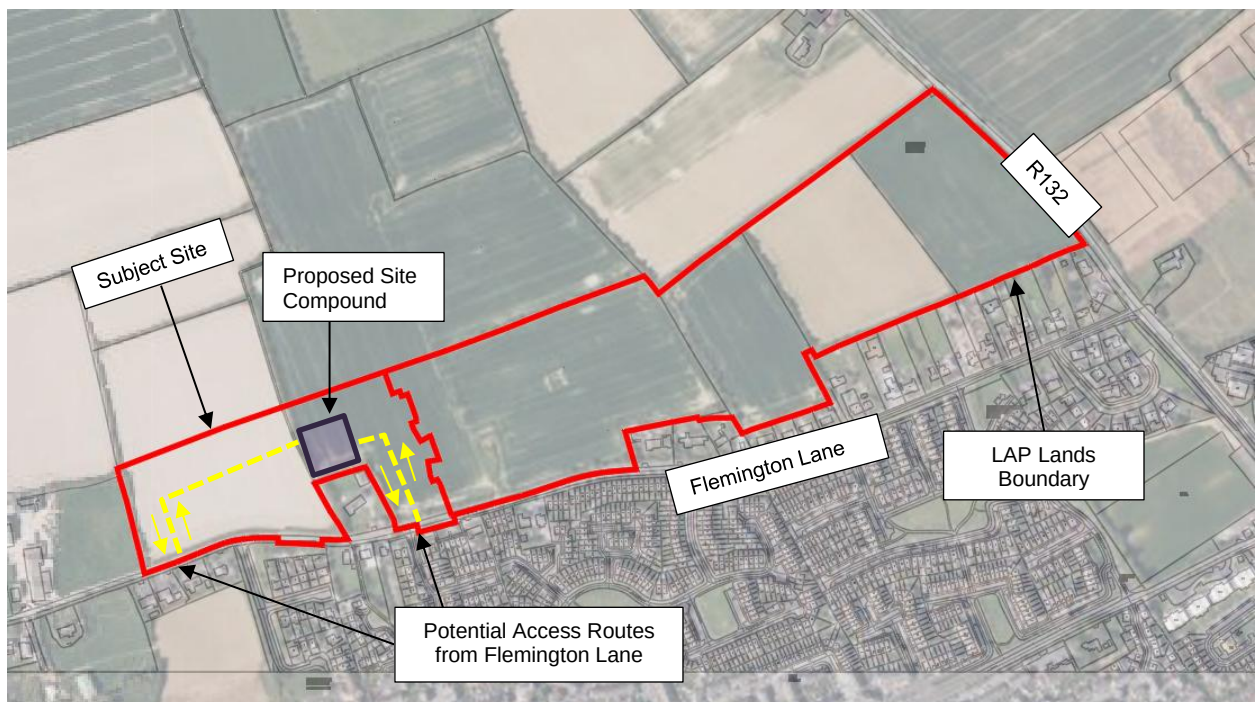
Proposed Site Compound Location and Potential Access Routes
